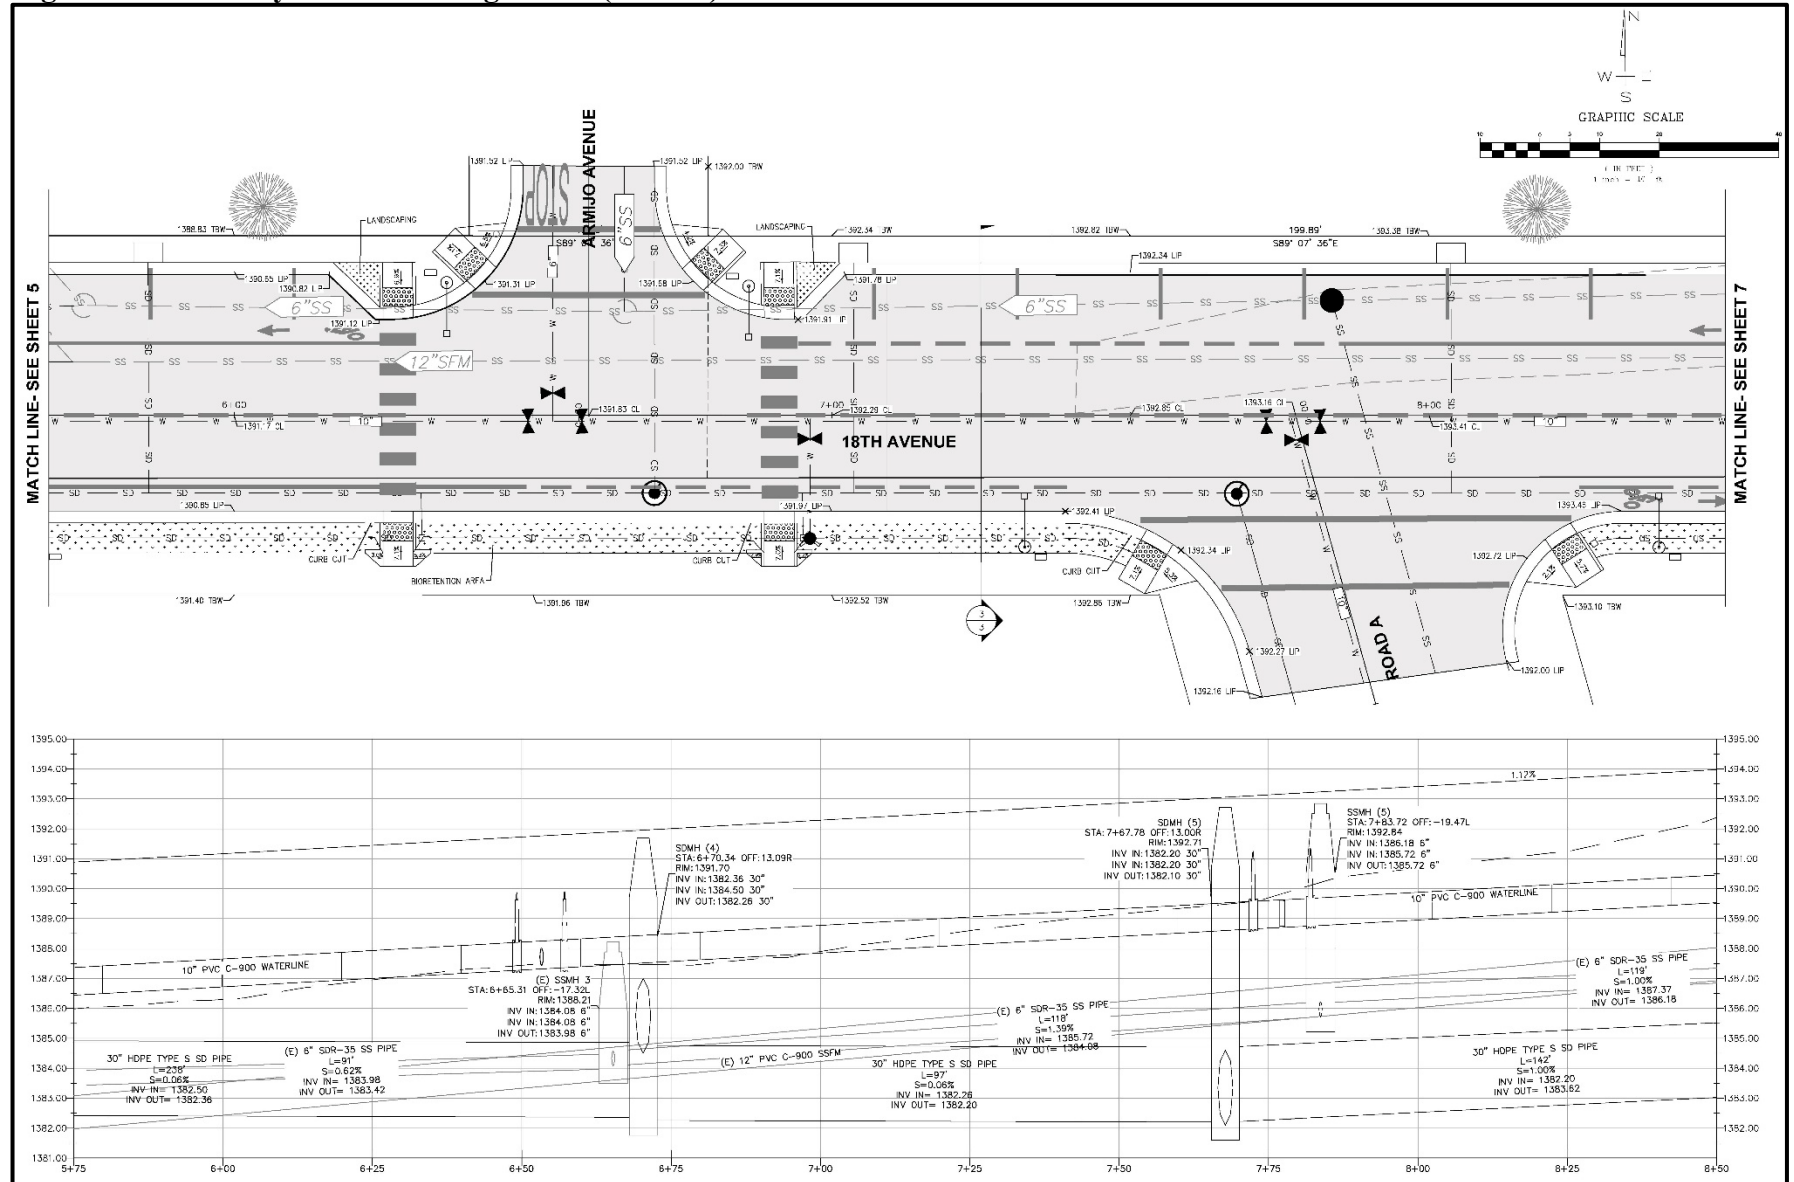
Roadway Site Plan – Segment 4 (Sheet 7)
